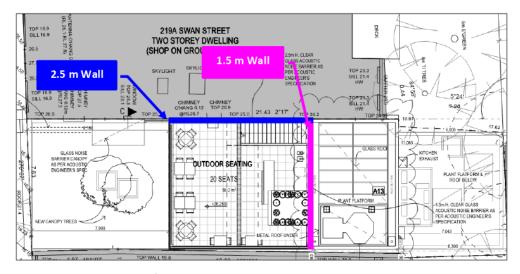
Locations of Walls / Noise Barrier at Boundary of Roof Top (Image Source: YBL Remmus Architecture)
